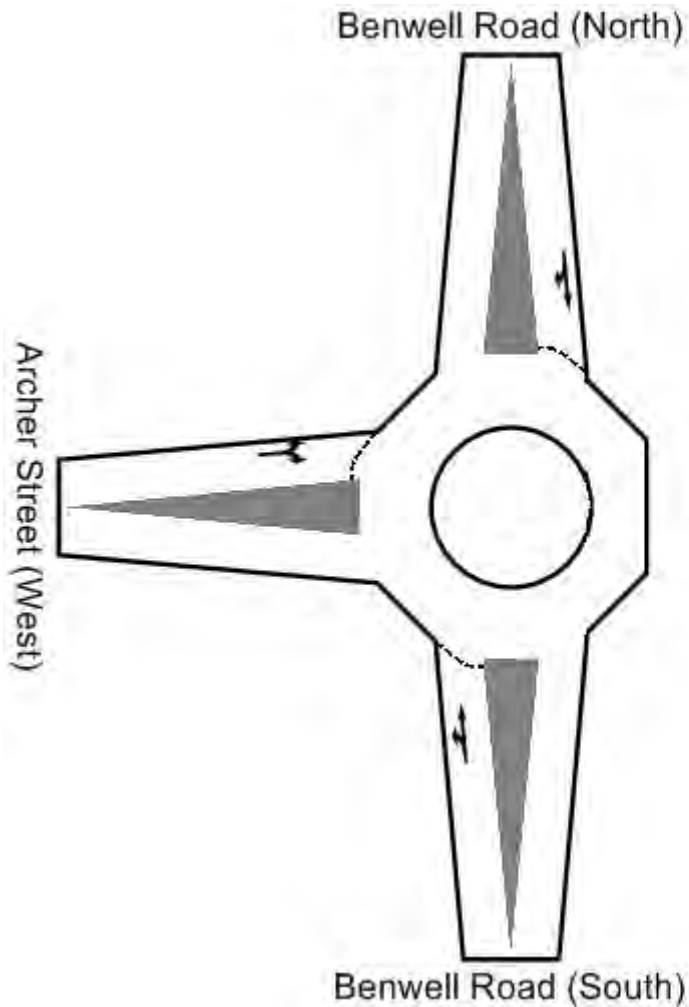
Benwell Road / Archer Street Intersection Layout - Roundabout
